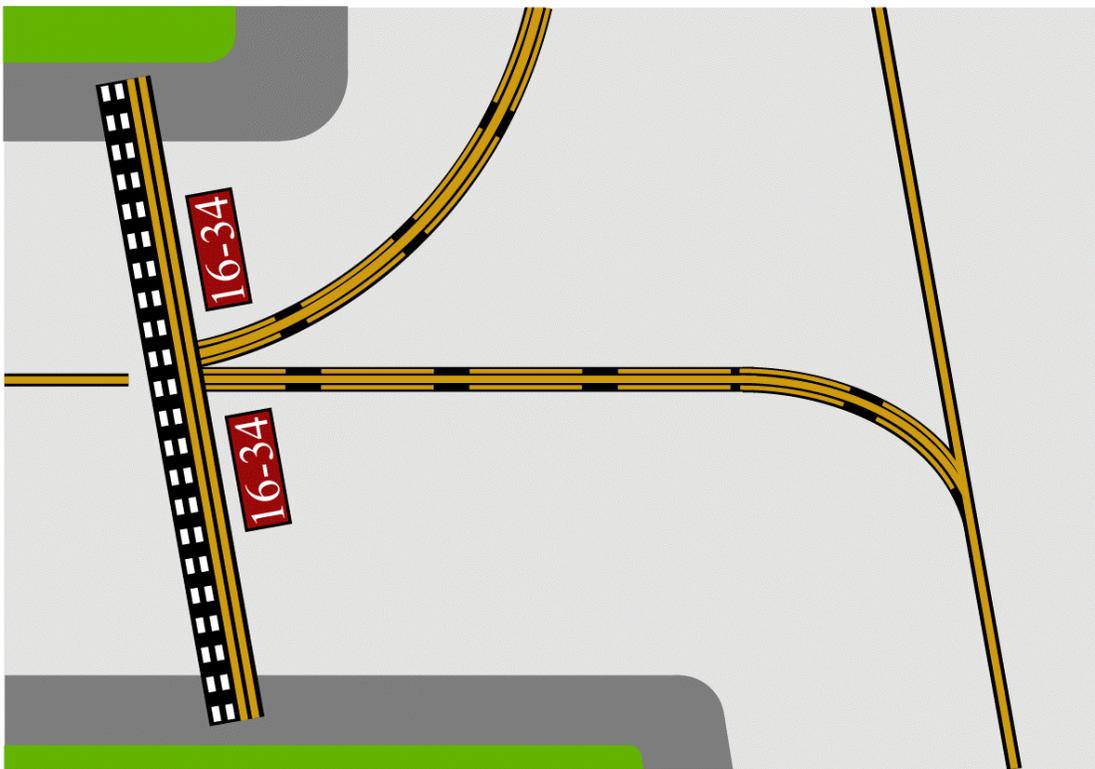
Two Taxiway Centerlines Converging at a Runway Holding Position Marking
